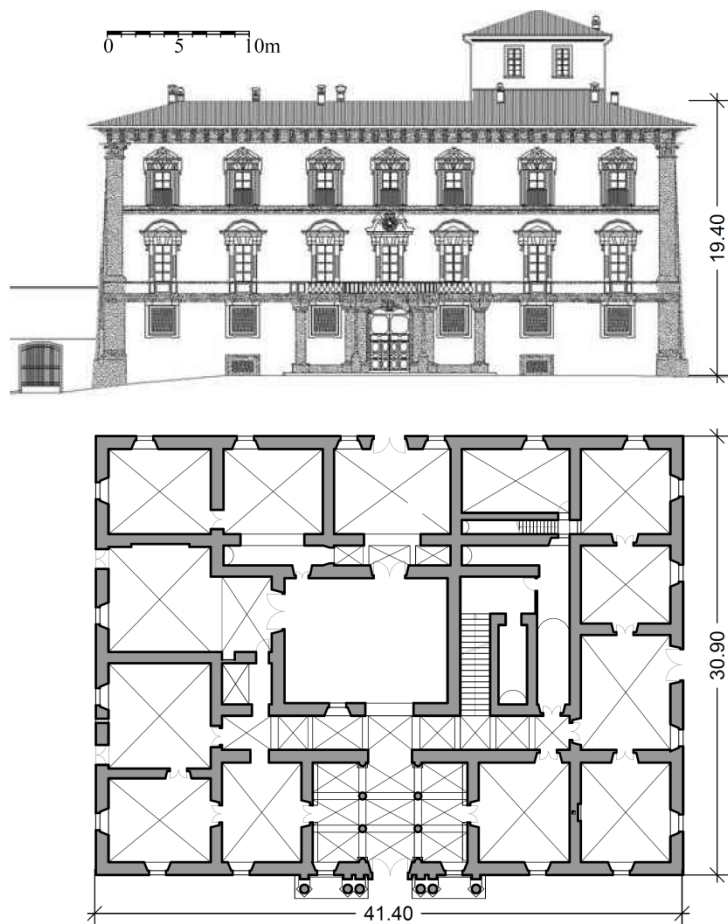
Palazzo Centi*: frontal view and plan of the first floor
